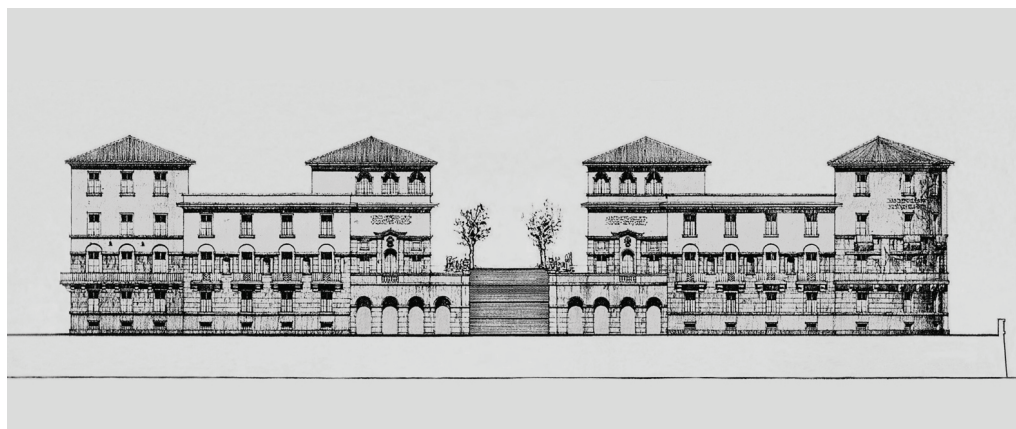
Main elevation of the INCIS buildings in Viale Marconi, second lot: ATER 2006, p. 41.
